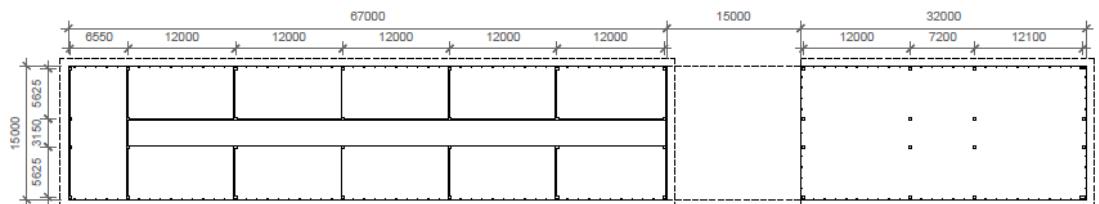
A typical floor plan of the air-conditioned floors
